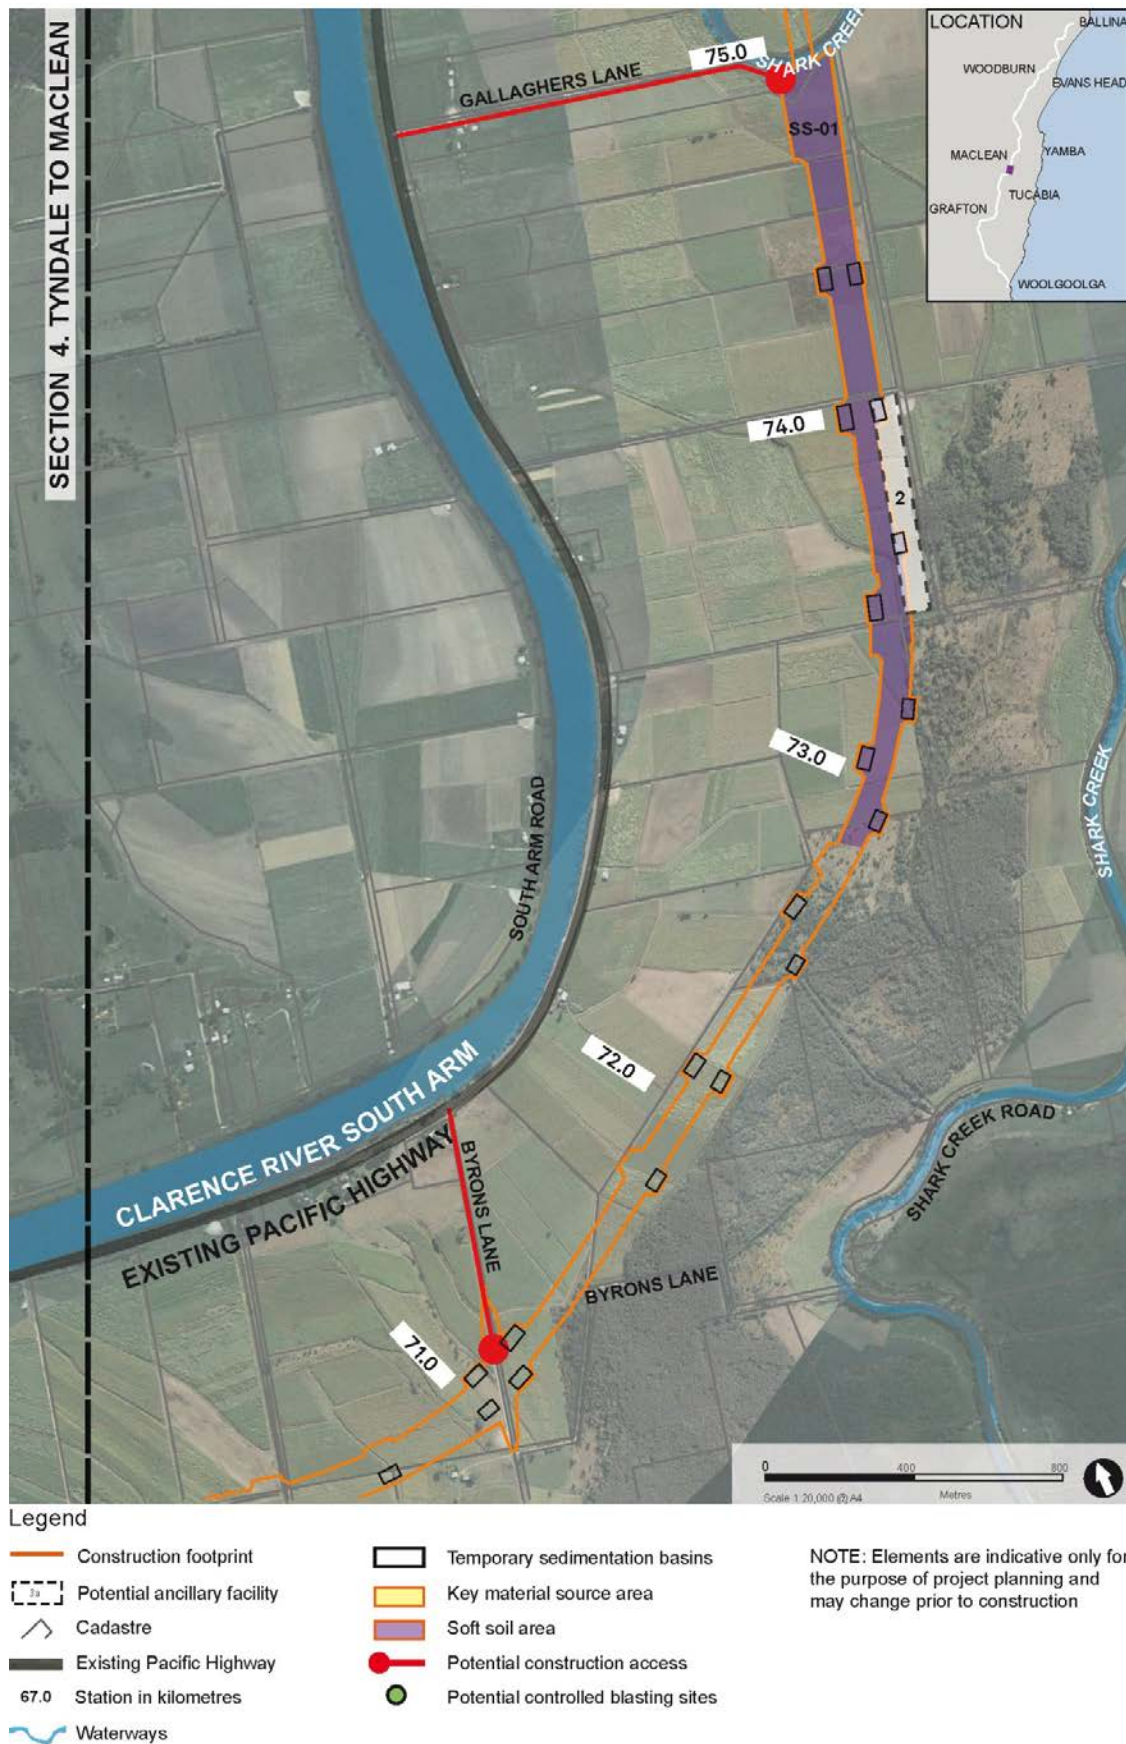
Extent of construction and construction features Section 4 (Station 70.8 to 75.1)
